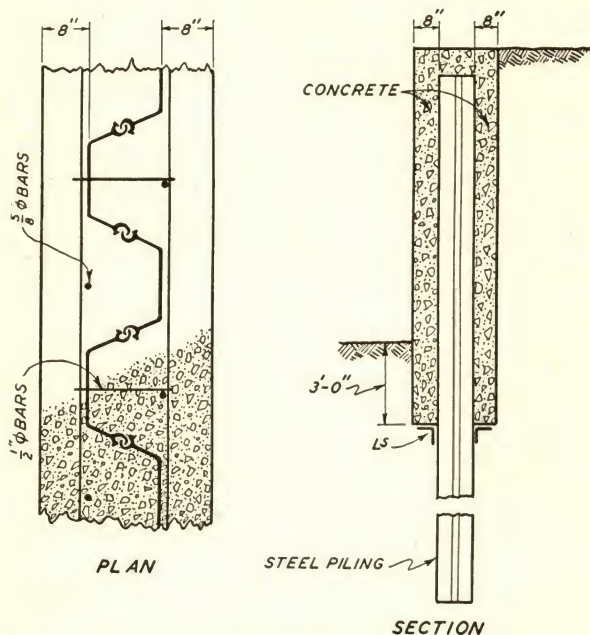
Retaining Wall of Arch Web Steel Sheet Piling Protected by Concrete
